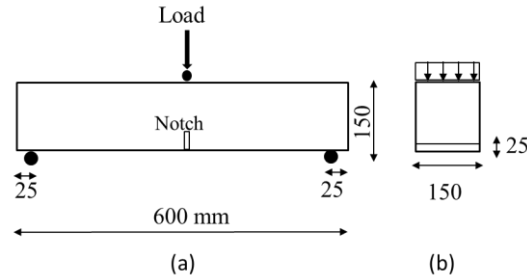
Specimen dimensions; (a) Elevation, (b) Cross section
